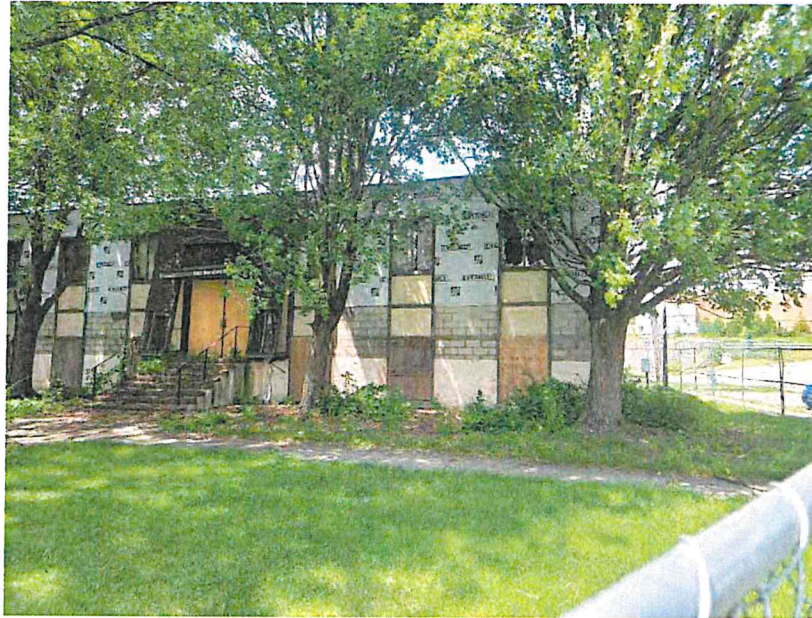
Building no. 1 view from Heckman Street side of building taken from grassy area, with broken and boarded up windows.
